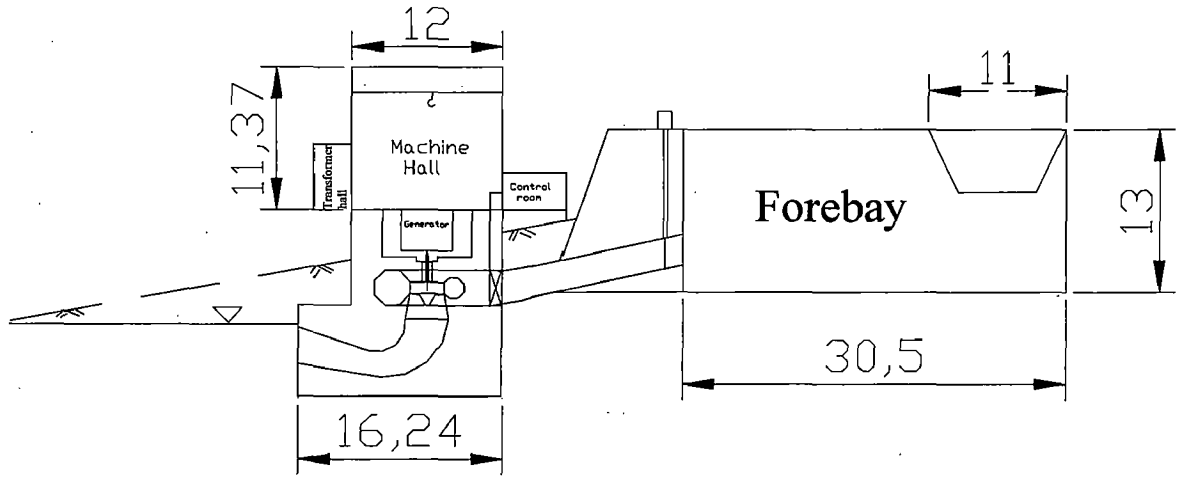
Plan of General layout of Powerhouse and Forebay
